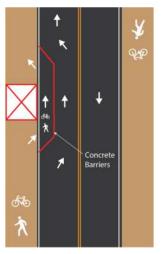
Re-alignment of pedestrian and bicycle traffic using concrete barriers as protection mechanism
